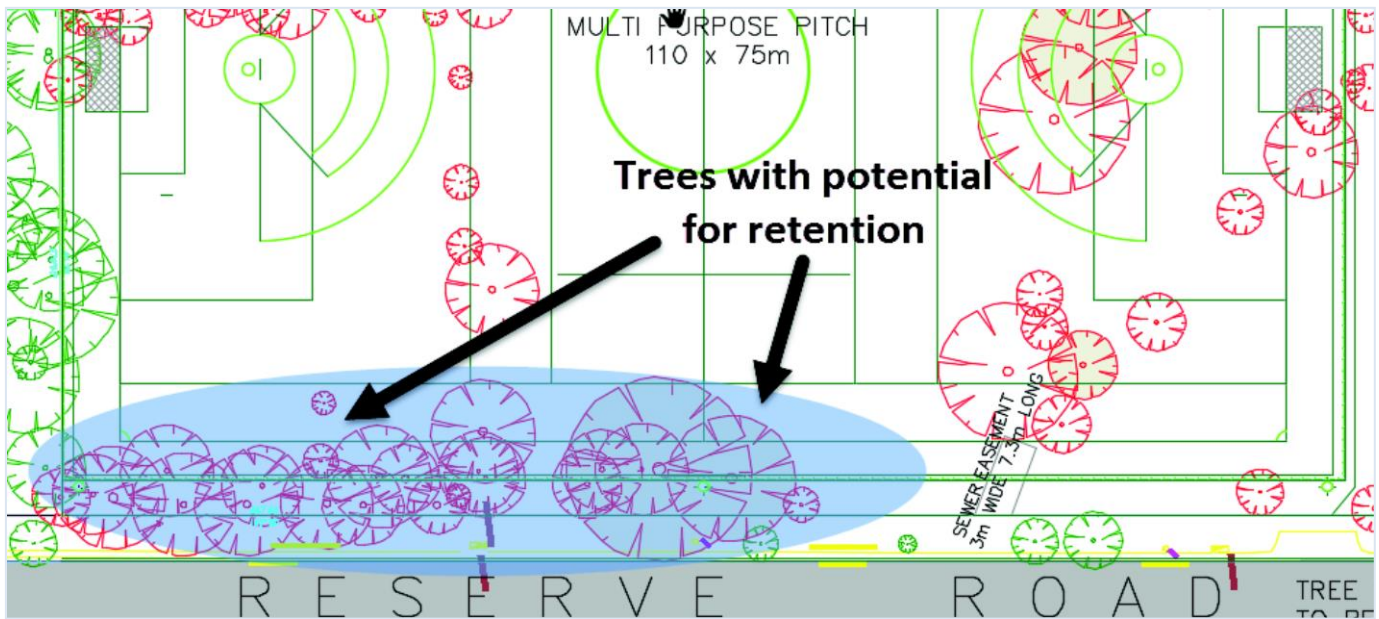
Tree with potential to be retained at Reserve Road Frontage
